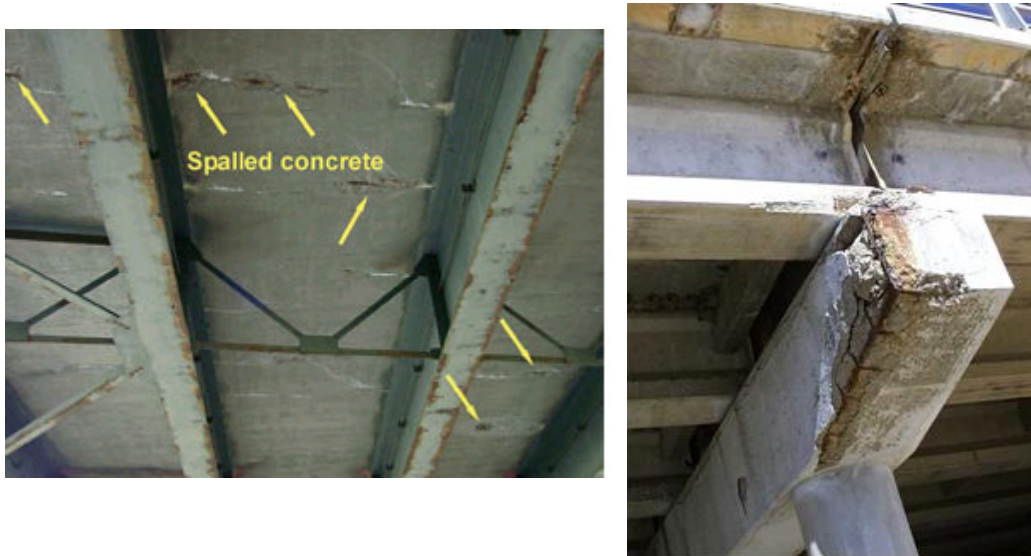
(left) Corrosion due to deicer salts causing cracking and spalling on the underside of the bridge deck in Albany, NY [5]. (right) Spalling of concrete bridge bent, Lubbock, TX [6].
